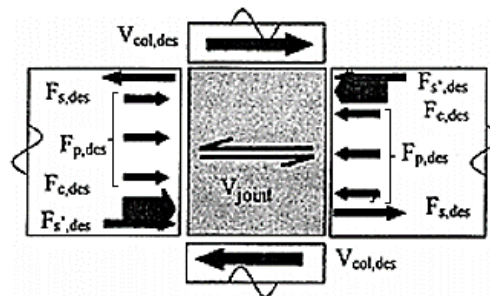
Partially prestressed concrete interior joint horizontal shear forces [21]
